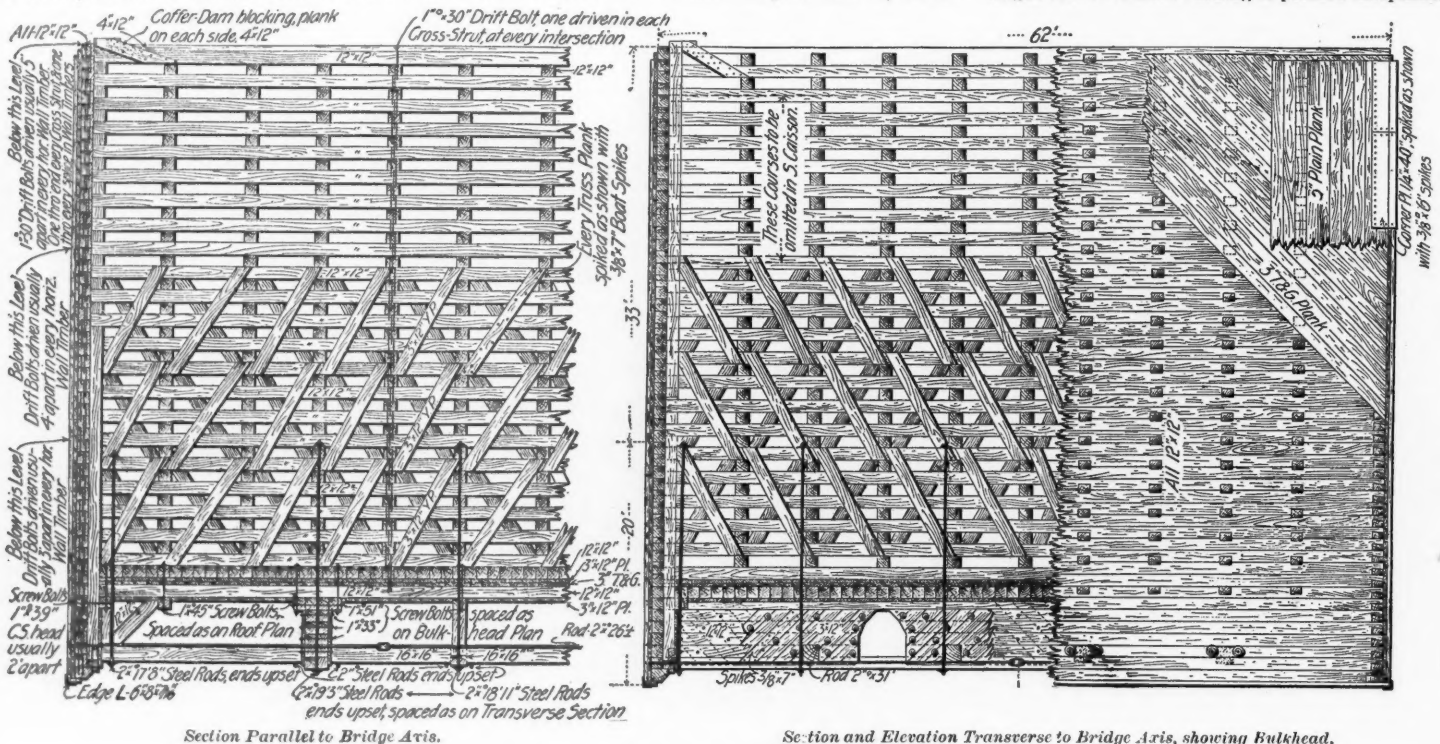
Details of Caisson for the North Pier of the Brooklyn Tower of the New East River Bridge
